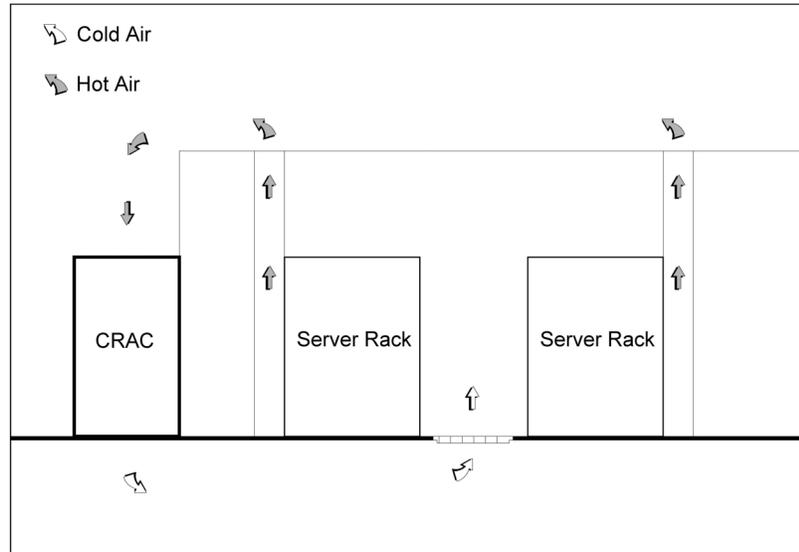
Raised-access floor supply/ducted ceiling return.
